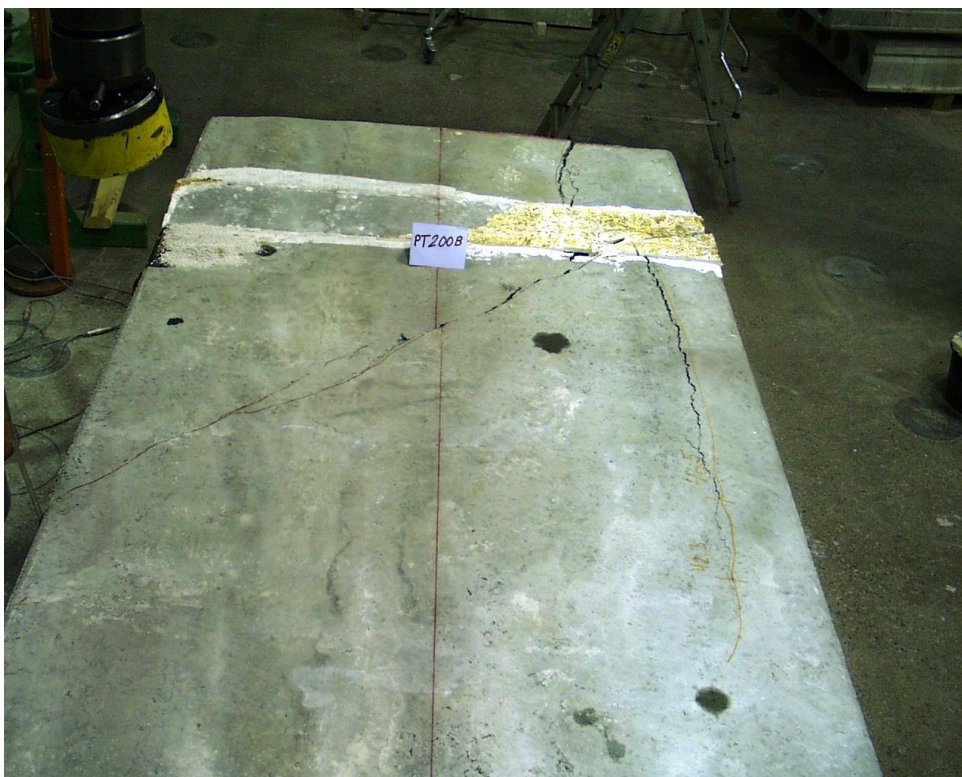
PT200B. Cracks on the top surface after removal of loads and loading equipment.
